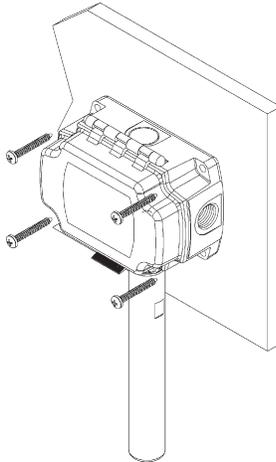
Hanging Bracket, 2" & 4" Buffer w/Plastic Threaded Fitting
